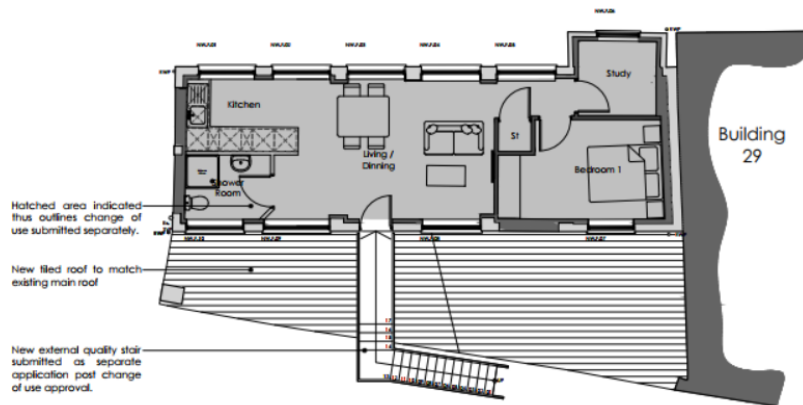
Proposed First Floor Plan – Layout for clarity and will be subject to a separate future change of use application.
